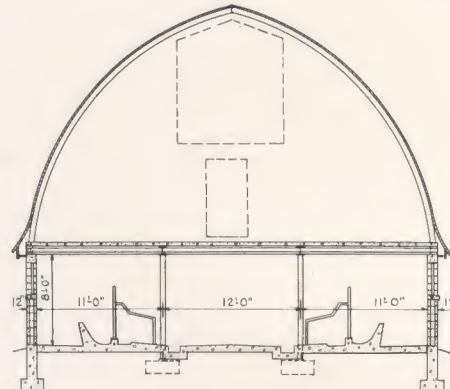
Cross-section of 36-ft. wide dairy barn.
